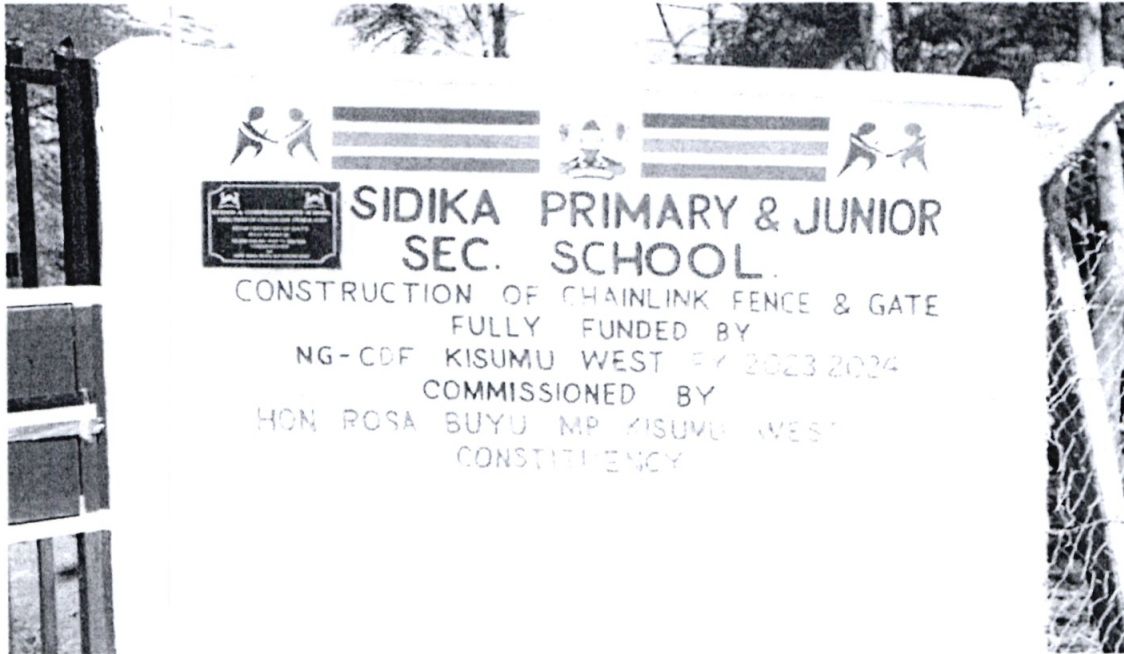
Photo of completed and installed construction of chainlink fence and gate at Sidika Primary School
